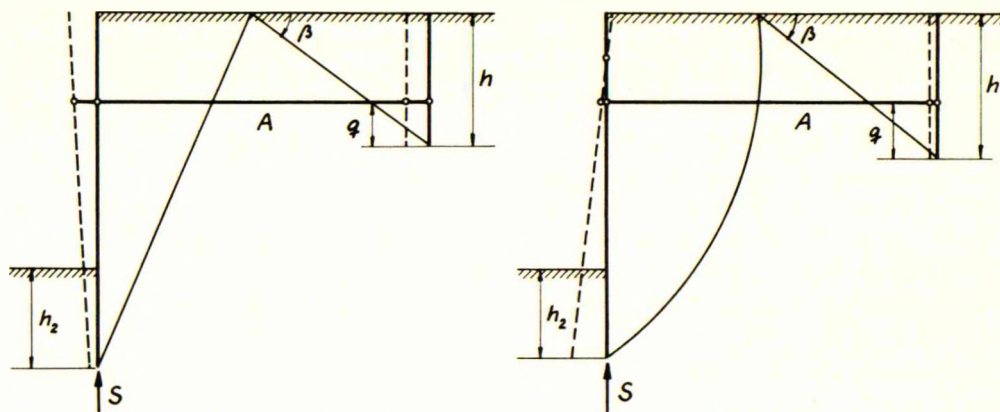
J: Sheet wall and anchor slab, connected by anchor bars
